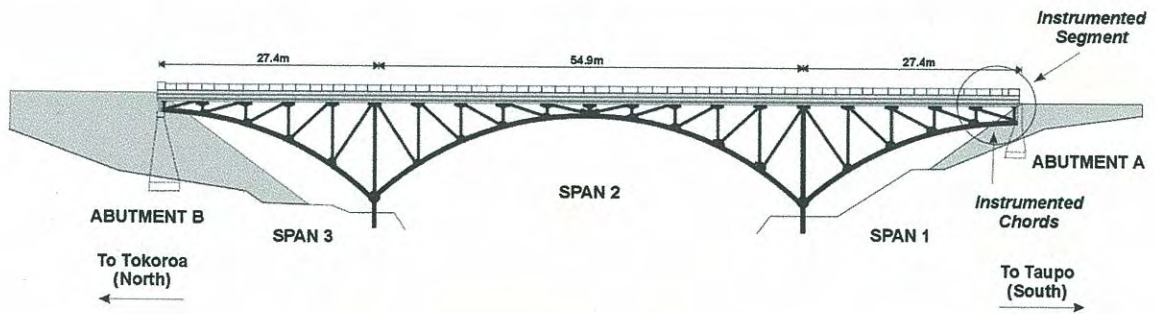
Cross section of the Atiamuri Bridge showing the position of the instrumented segment of the truss.
